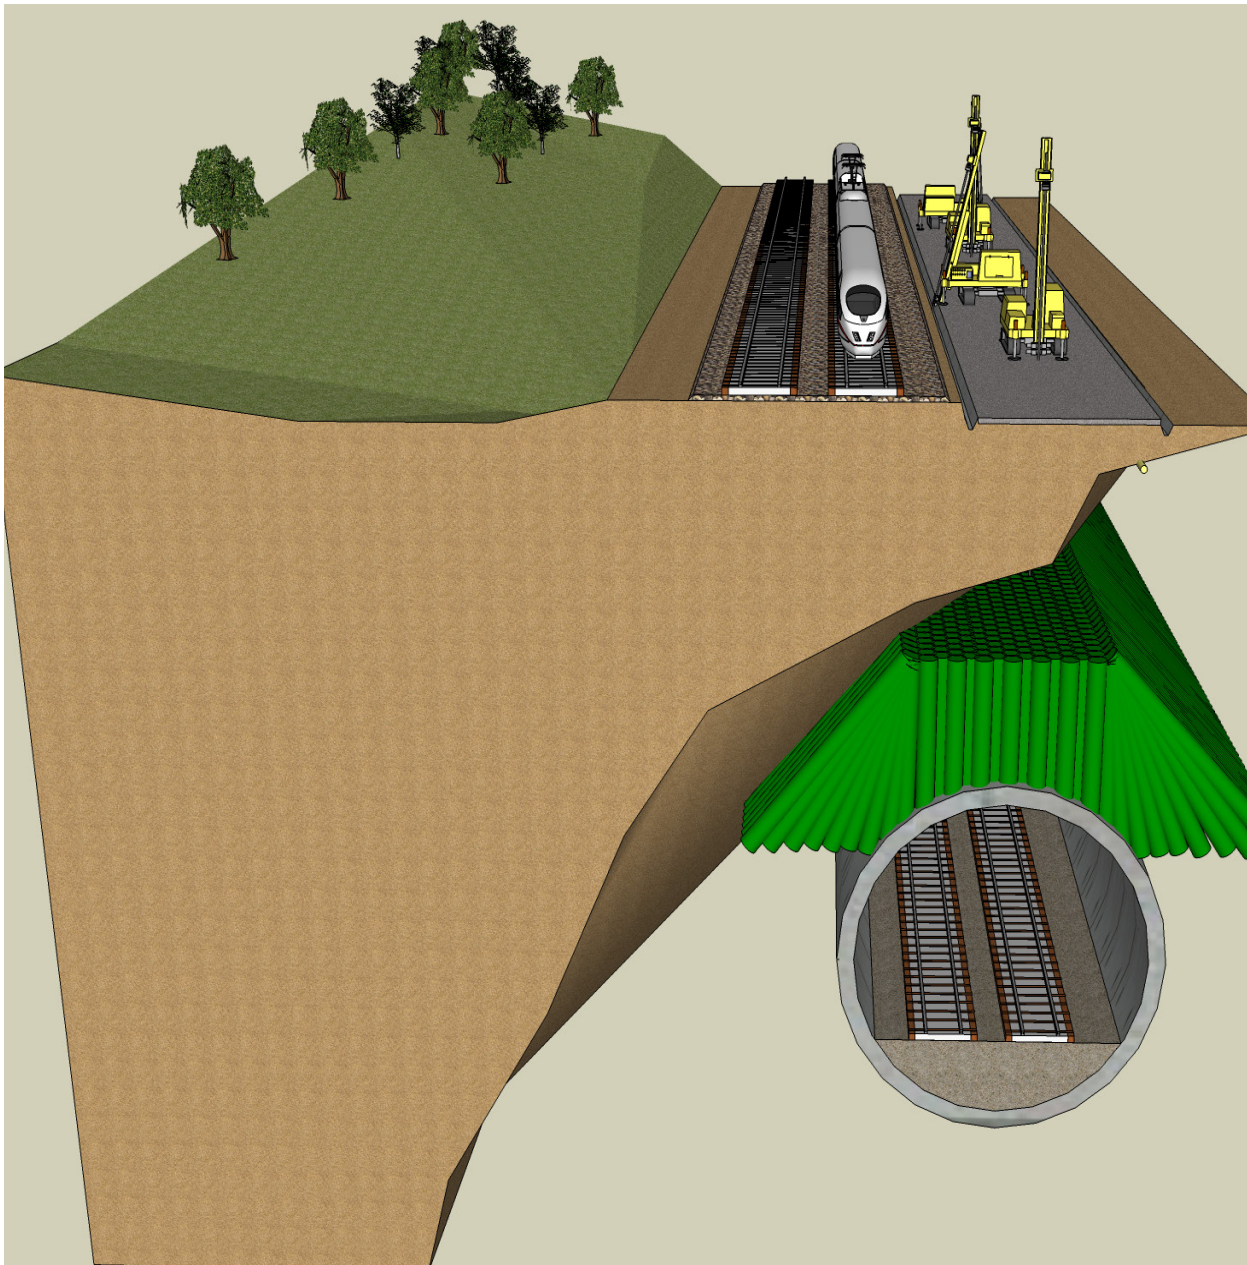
3D sketch showing inclined columns' layout and depth at "Riu Besos" location
